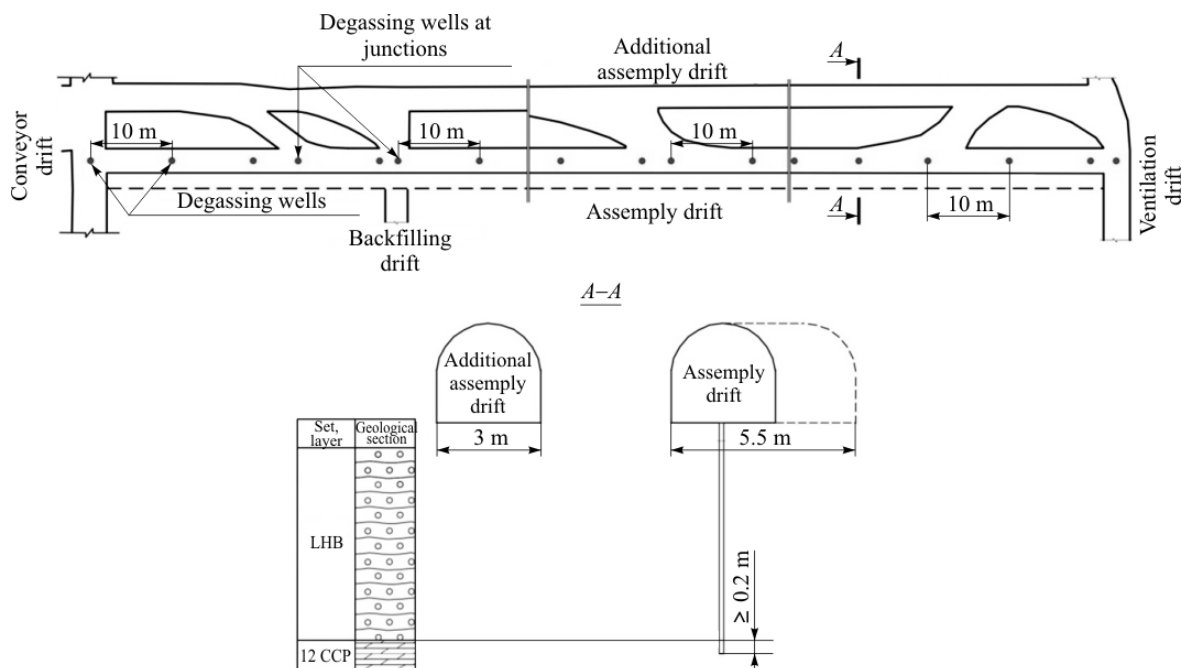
Scheme of preventive drilling of degassing wells into the soil of an assembly (dismounting) drift and junction of an assembly (dismounting) drift with conveyor, ventilation and other drifts and excavations located in the field of a long face
